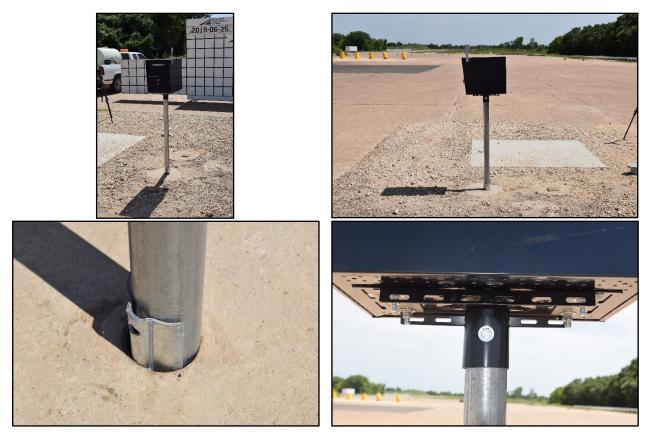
Lockable Mailbox on Steel Tube Post prior to Testing.
